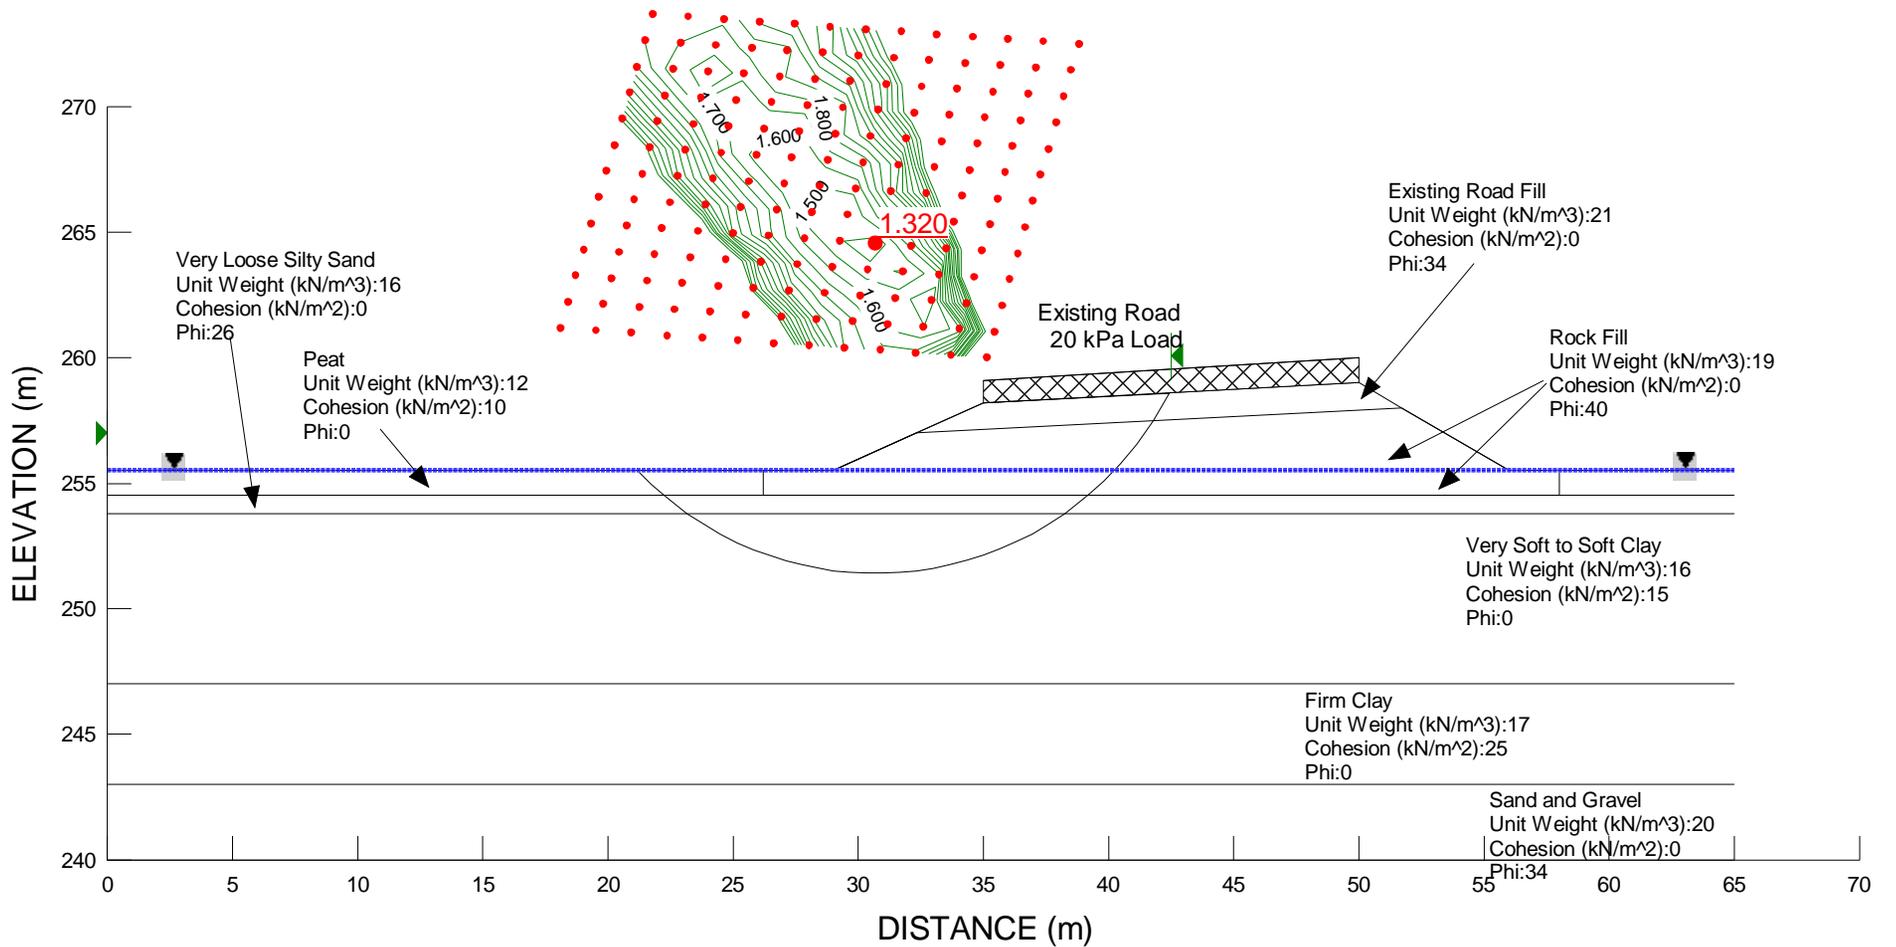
Slope Stability Analysis of Section at Station 18+975 - 2.5 m Road Widening (End of Construction - Slip Surface within Westbound Lane)
